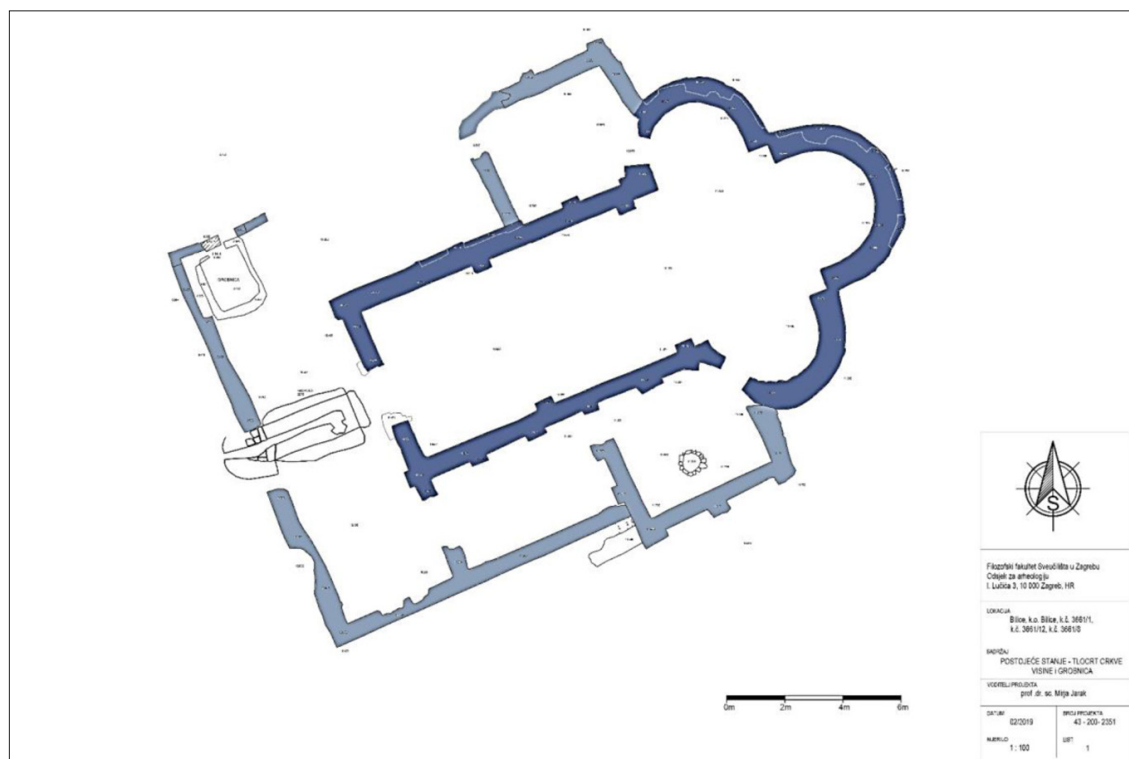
Bilice, new ground-plan with two building phases (Photo by M. Vuković, modification by P. Jeršek after M. Jarak).
